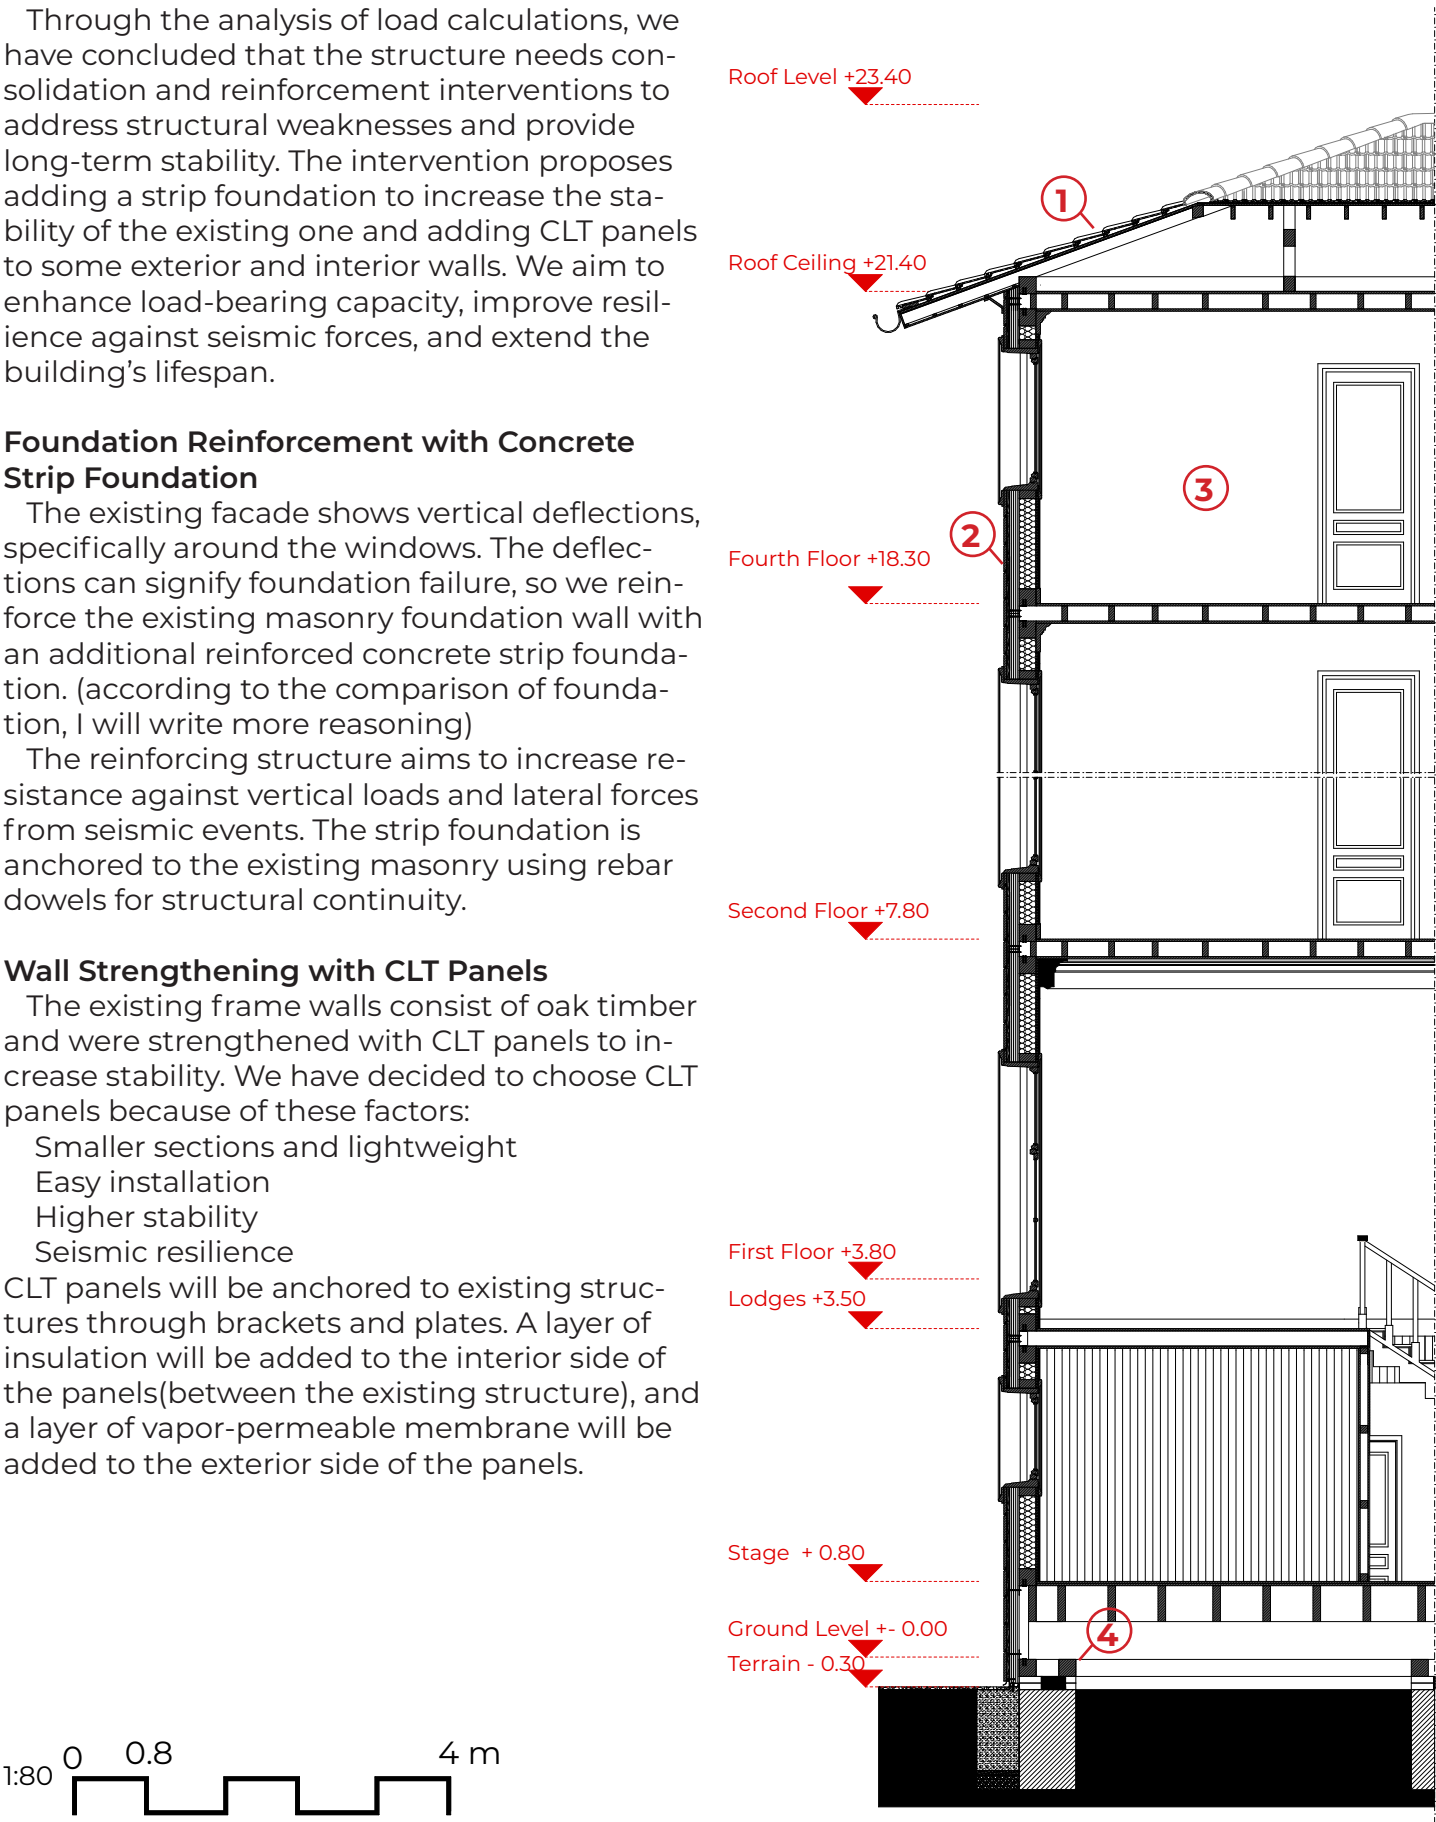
Consolidation Intervention Proposal Detail Section (Source: Created by the author, 2025)
